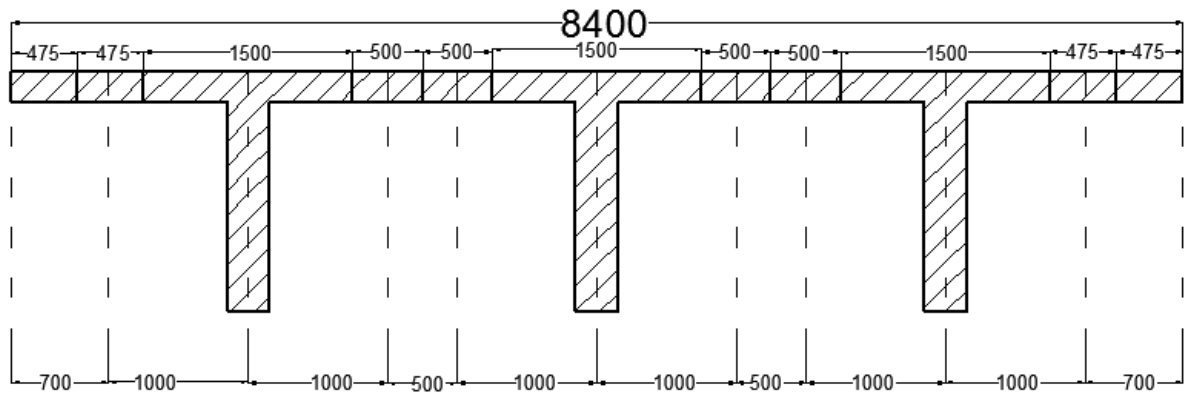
Grillage idealization in longitudinal direction (All dimensions in mm)
